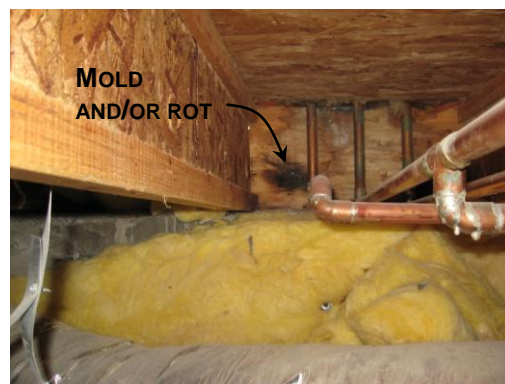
ADDITIONAL MINOR WATER DAMAGE AND POSSIBLE MOLD.
